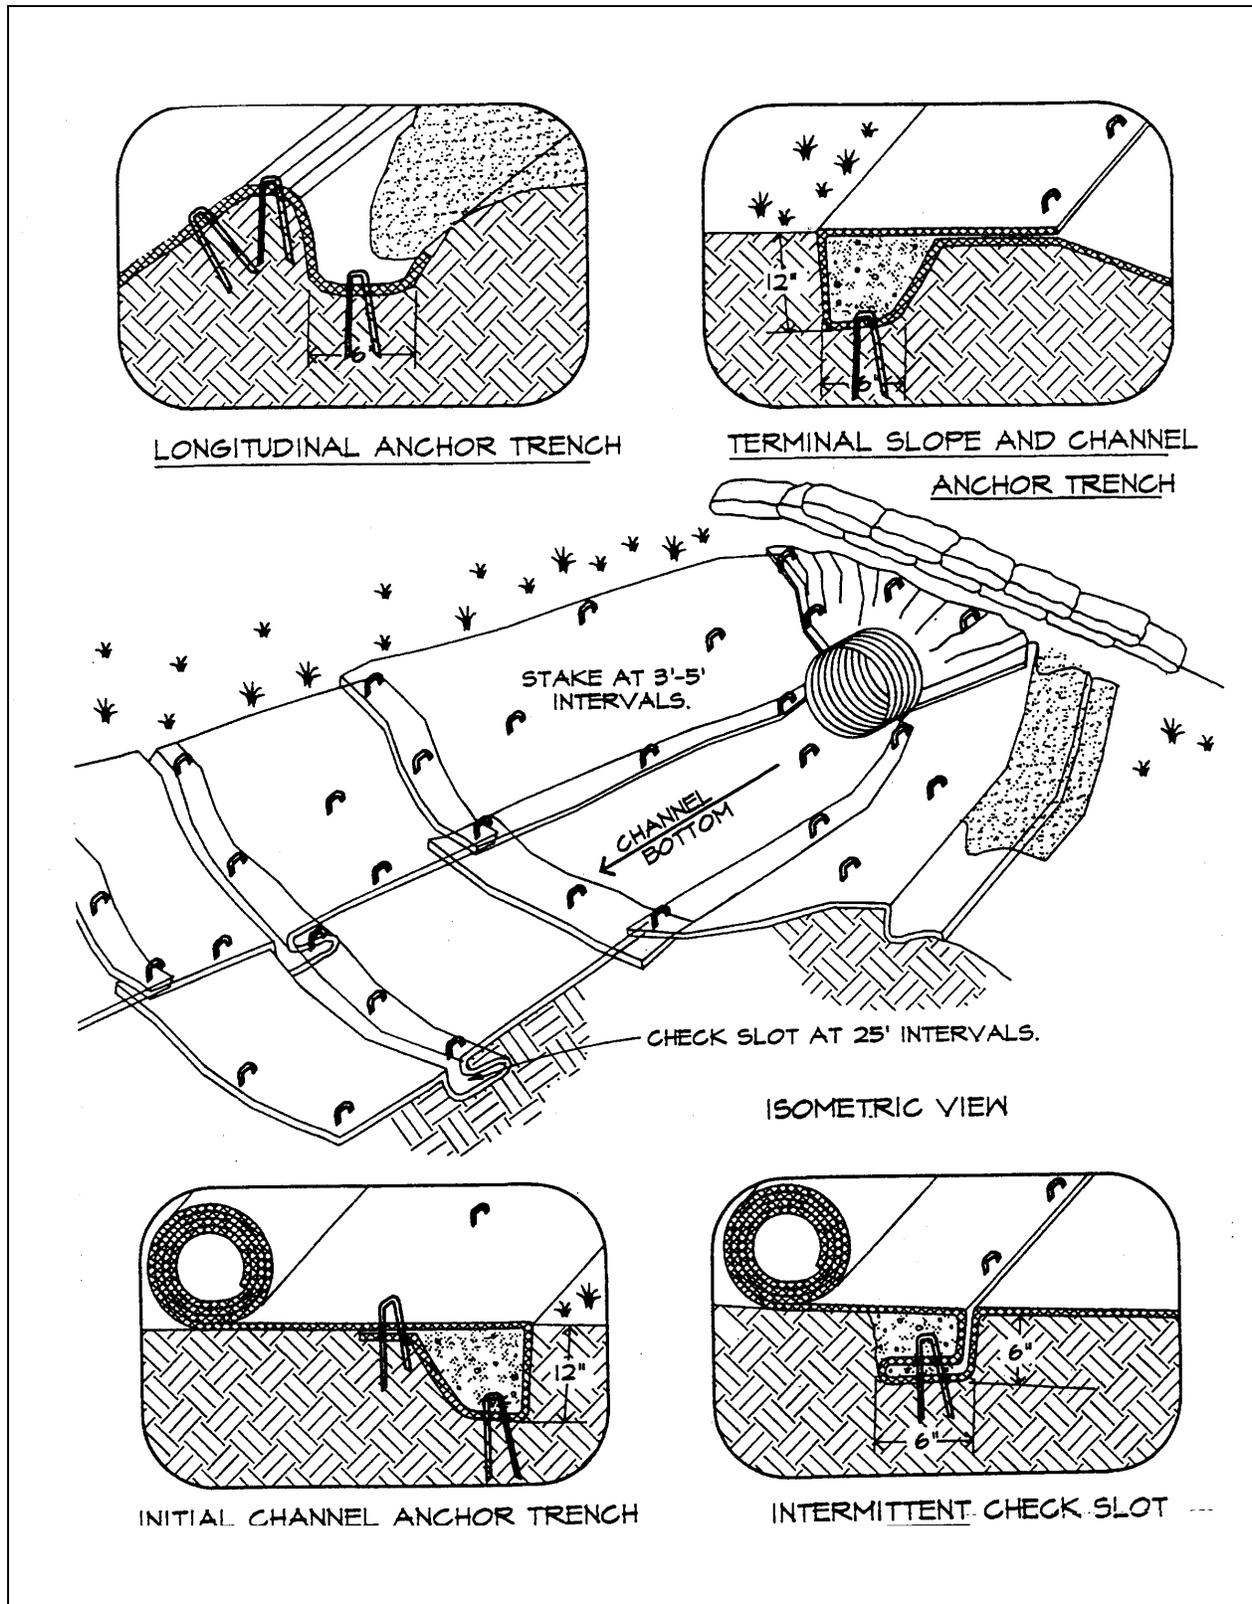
Erosion Blankets and Turf Reinforcement Mats - Channel Installation
